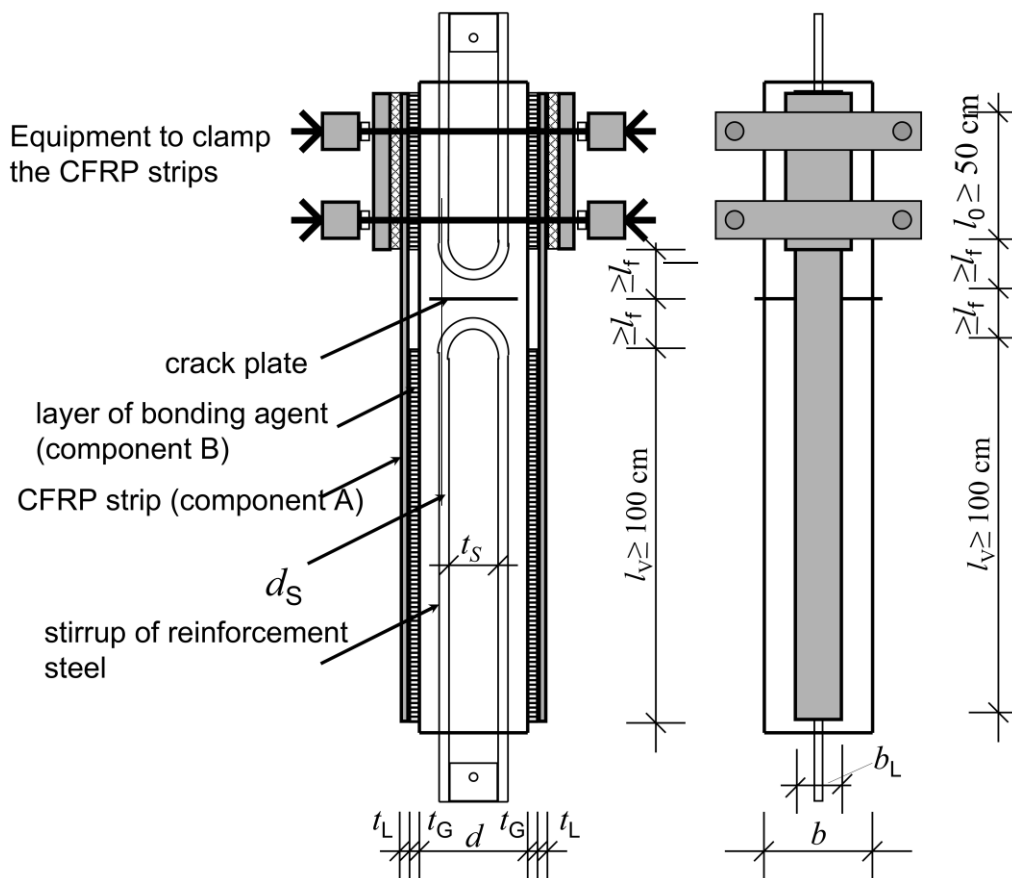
Tension-tension double-sided bond specimen to determine the bonding behaviour of bonded CFRP strips
